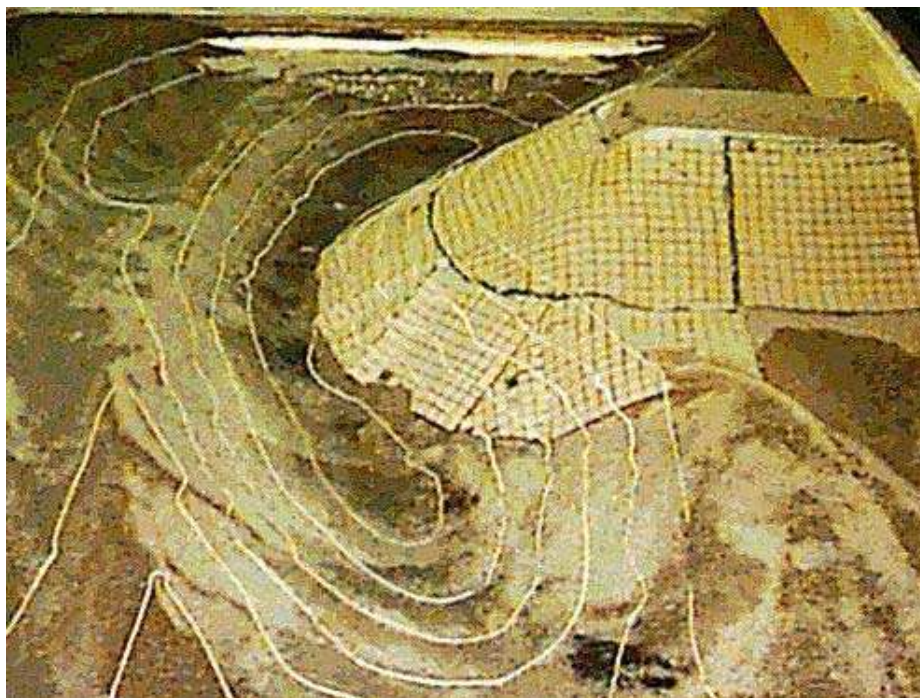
Typical scour hole development for failed cable-tied block protection (Test 6), viewed from downstream. The failure was due to slumping of the fill material near the top of the embankment
